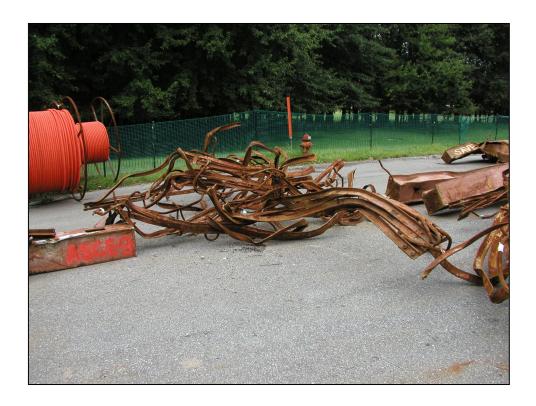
Recovered floor truss material, shown are portions of sample C-53.
